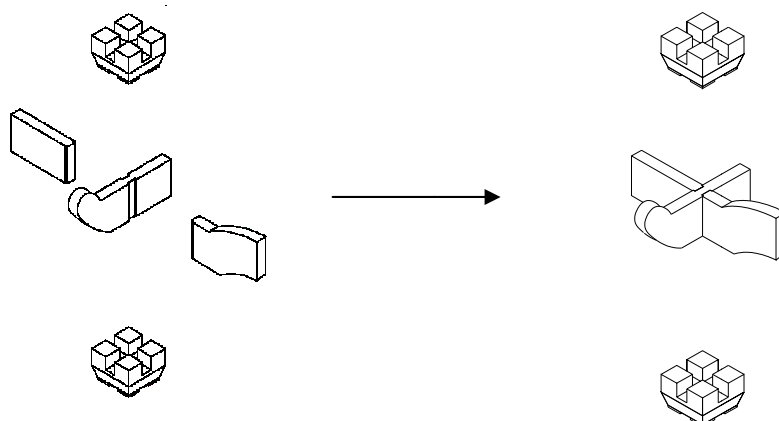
Construction of one layer of a Dieh-Dou joint
